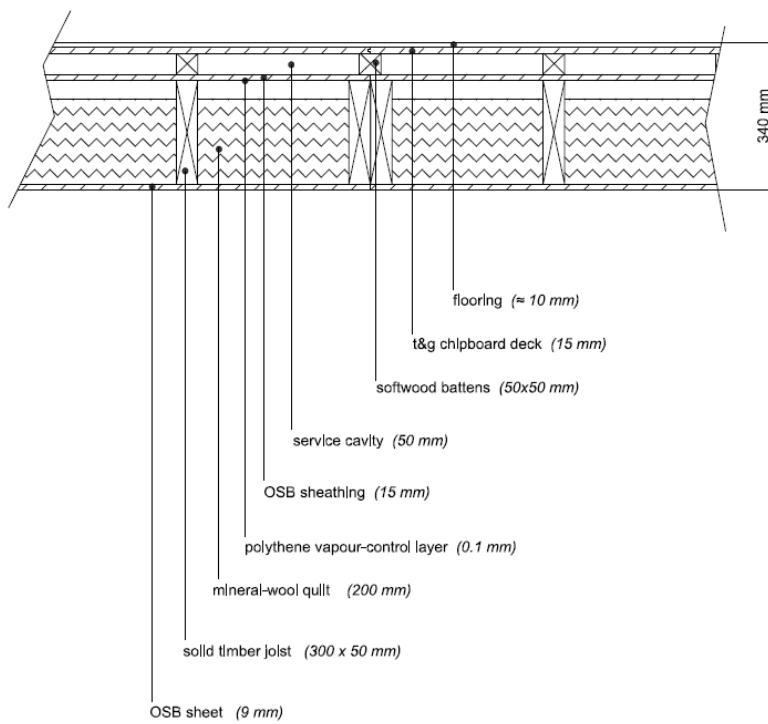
Ground floor B (timber frame, cassetted floor), cross-section.
